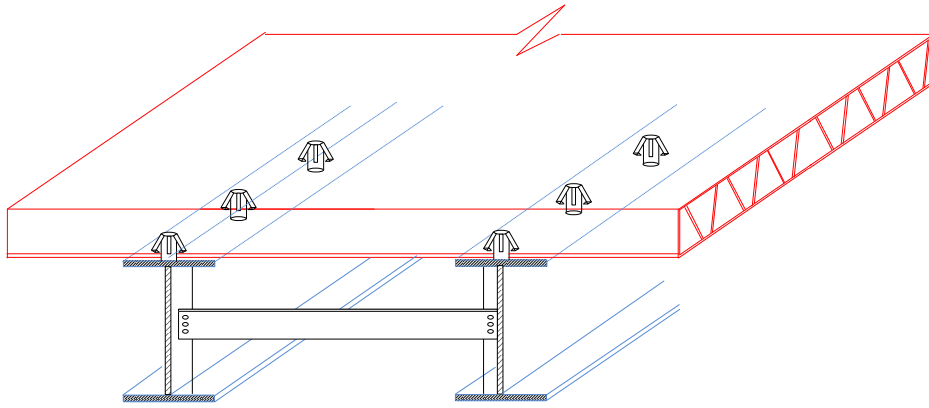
Snap-fit connection between steel girders and FRP deck
